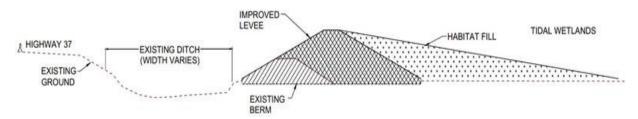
Schematic showing the concept of improving existing berms north of the SR 37 embankment.
